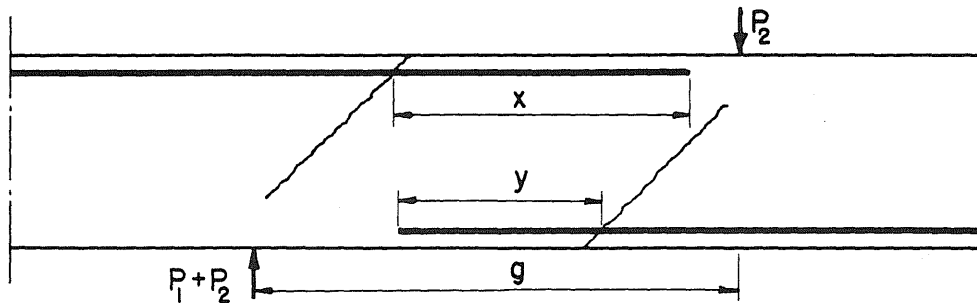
STRAIGHT BARS CUT OFF BEYOND POINT OF CONTRAFLEXURE RESTRAINED BEAMS
